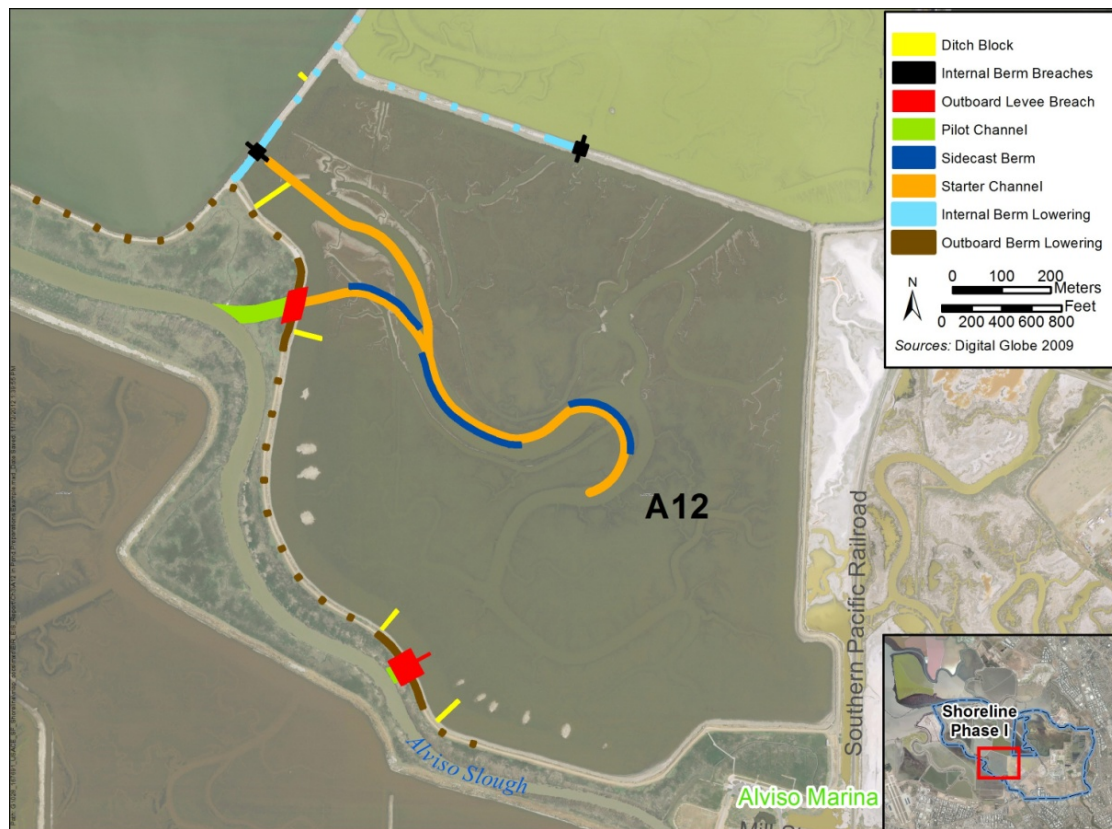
In-pond Preparation Actions Considered – Pond A12 Example
